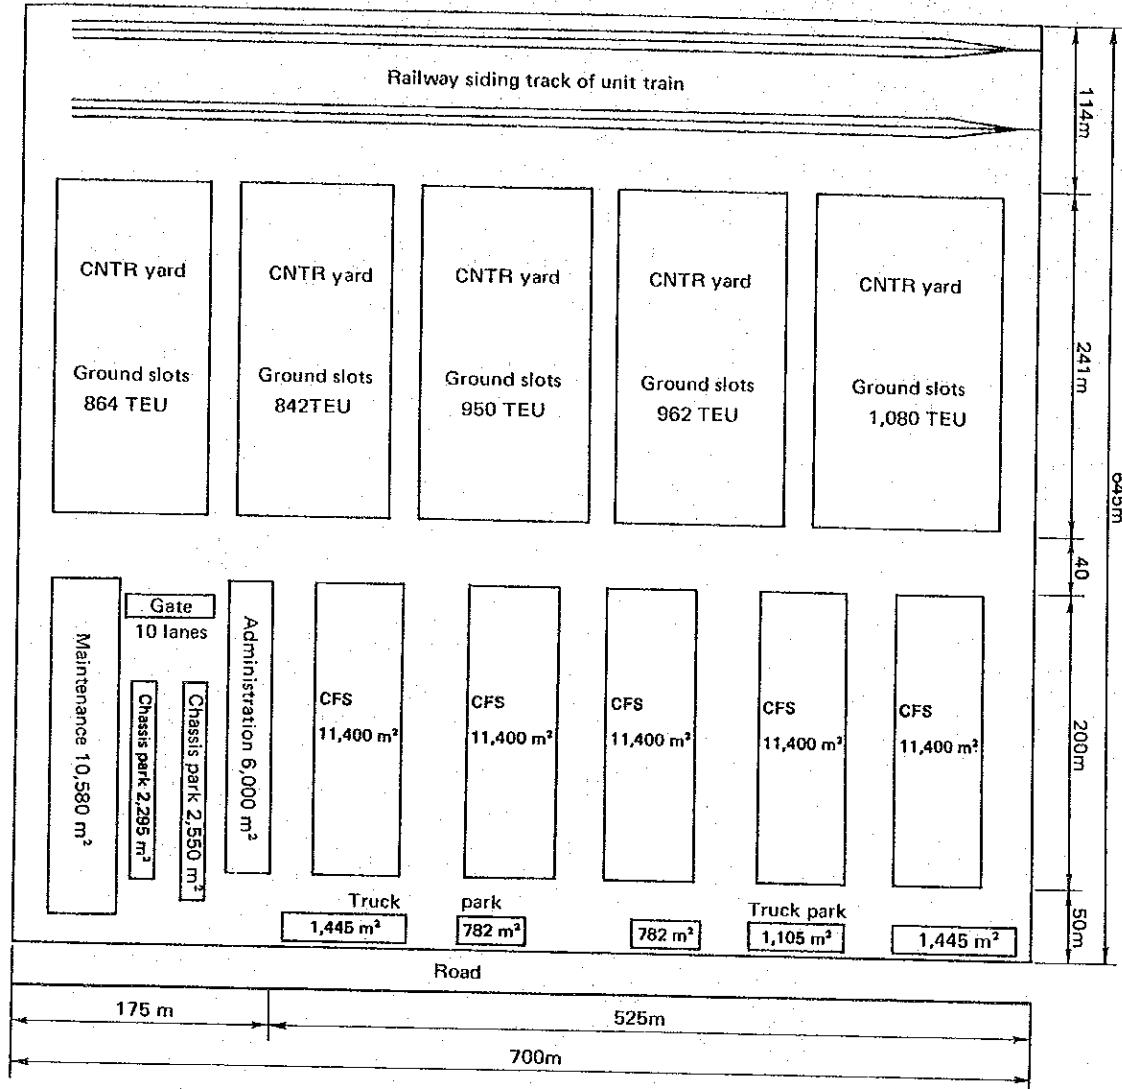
Layout of Inland Container Freight Station (Urgent Plan)
